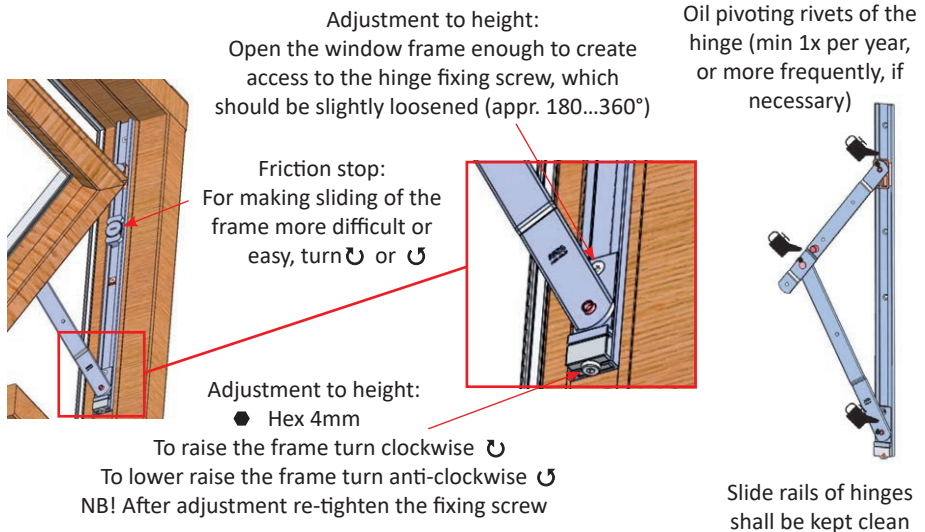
SW17 top guided window. Adjusting and lubricating
